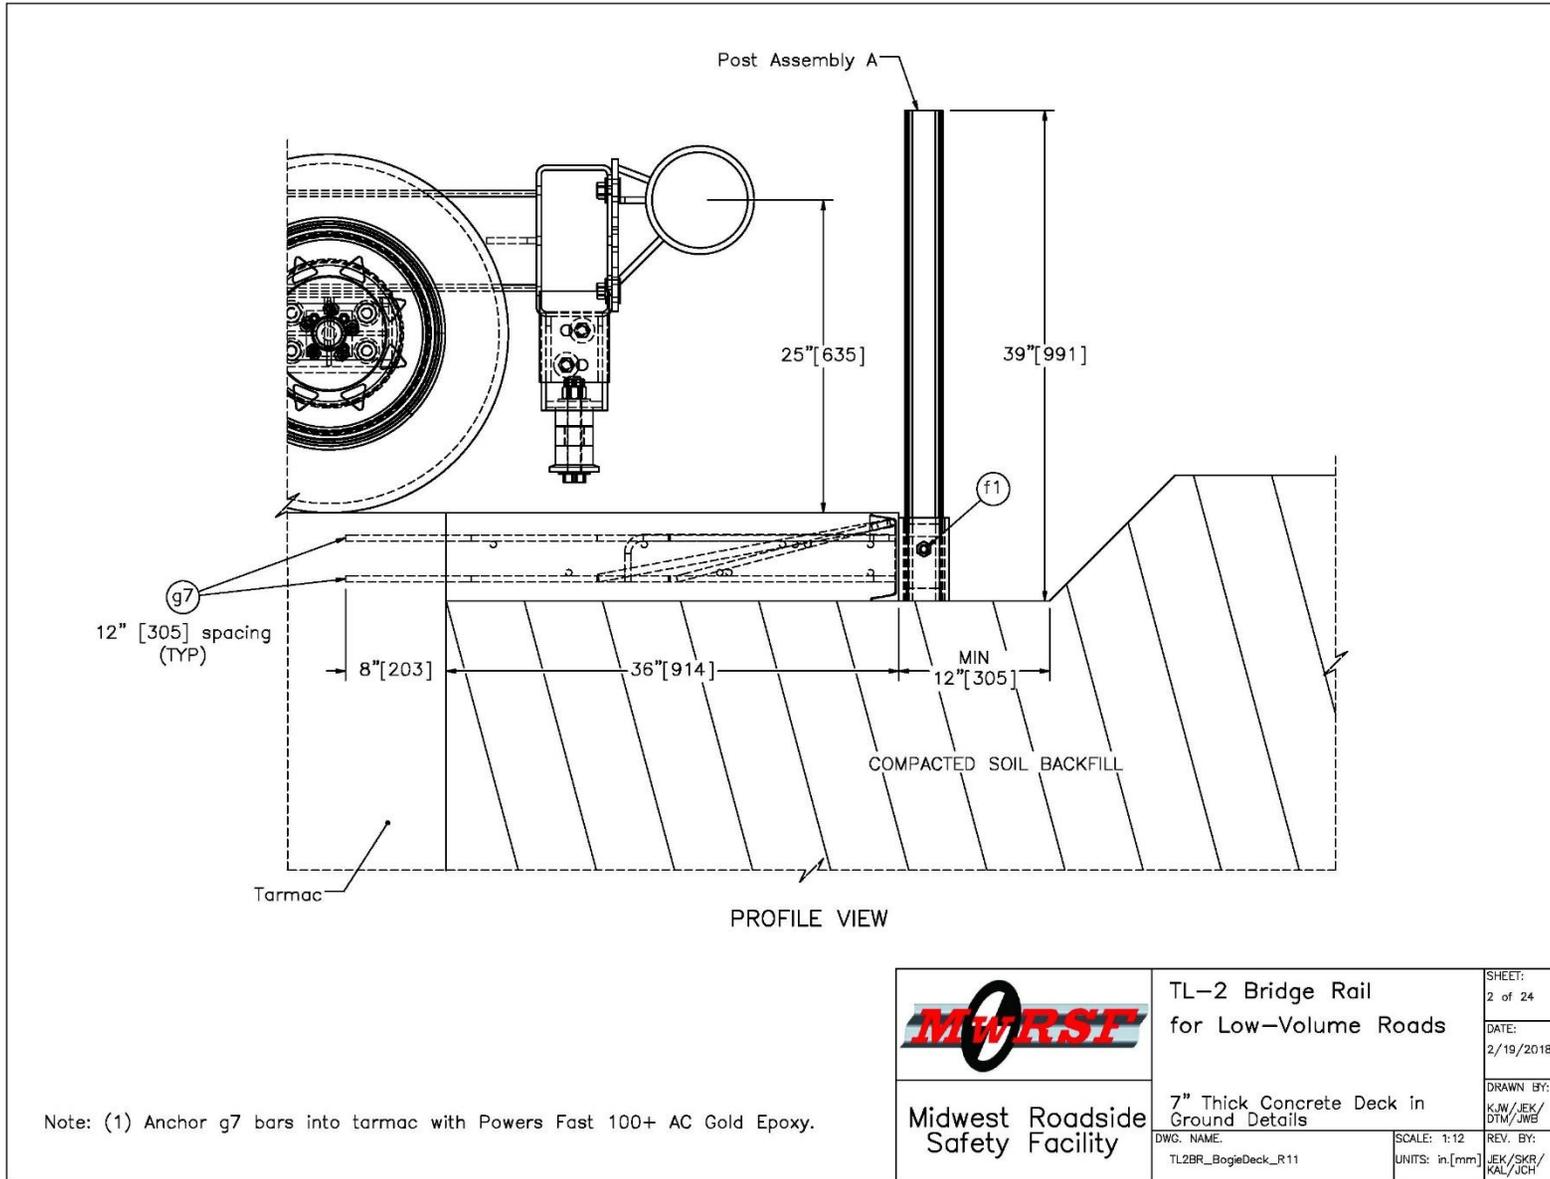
Bogie Testing Matrix and Setup, 7-in. Thick Concrete Deck in Ground Details
